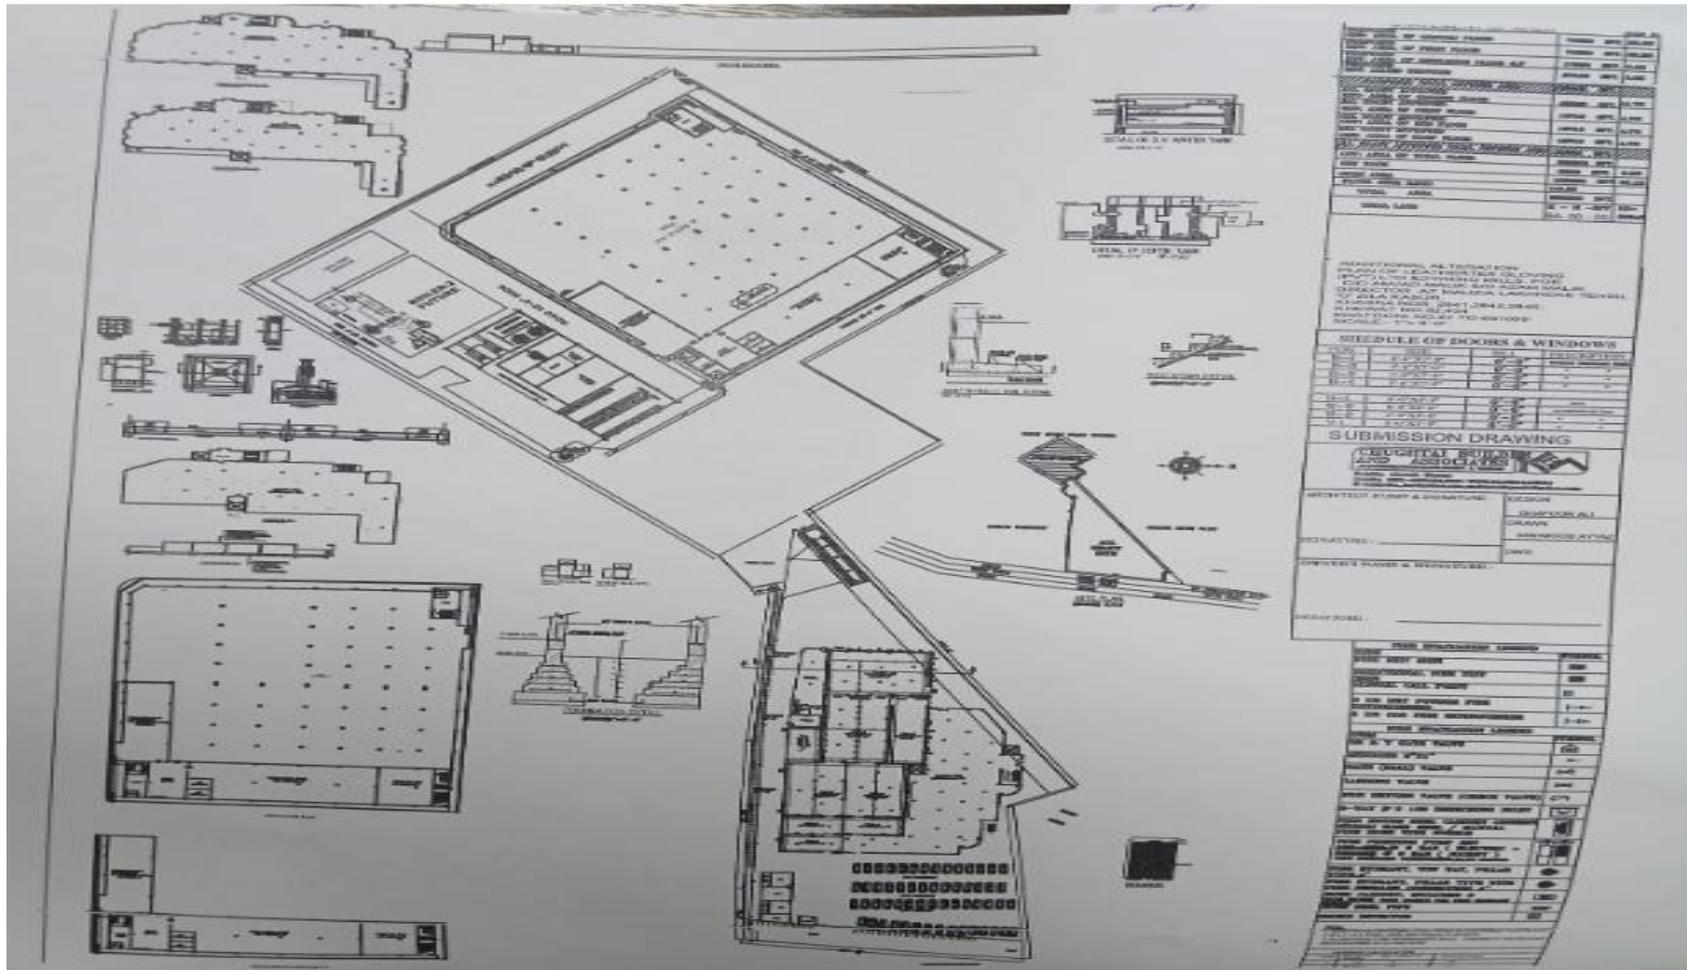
Layout Plan of Dyeing Unit (Expansion Project)
